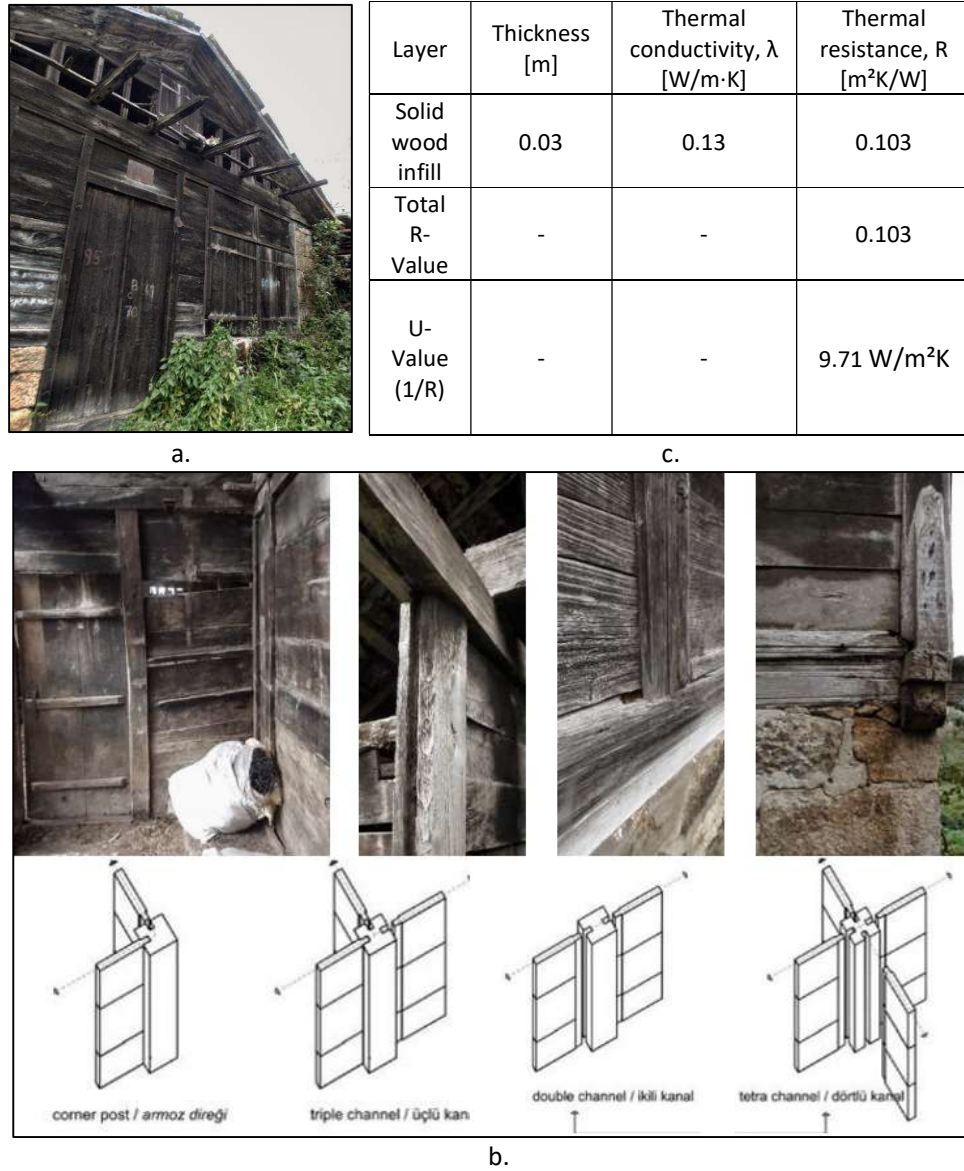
Timber-frame and board-infill configuration of the taraba wall system (Selected building from Cida): a. photographs of wall junction details (Author, 2024); b. technical drawing of wall connections [22]; c. layered wall section and calculation of thermal transmittance resistance
